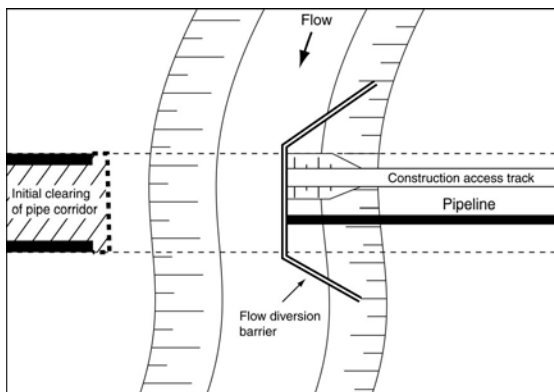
Stage 1 of pipe installation using an isolation barrier
